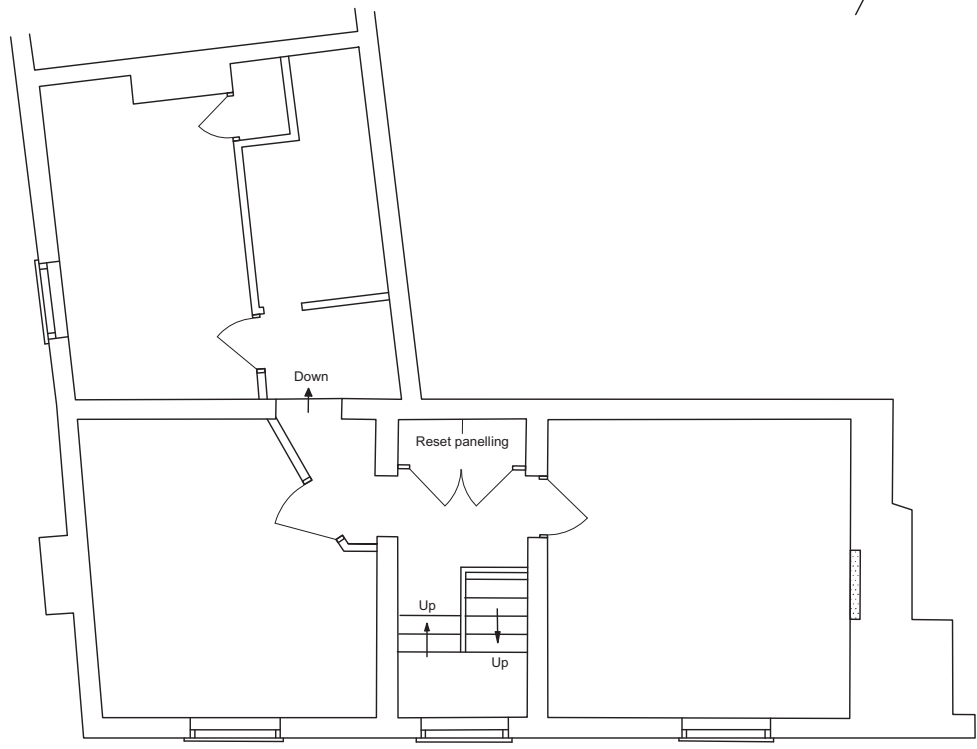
OLD STAR COTTAGE, 1 MAIN STREET, FRISBY-ON-THE-WREAKE : Ground Floor Plan 1:100
